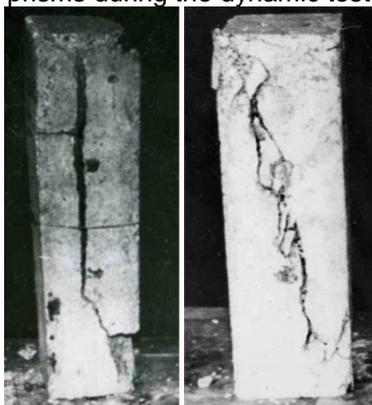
Typical view of failures of prisms following a dynamic impact: on the left are concrete prisms, on the right are fibreconcrete prisms
